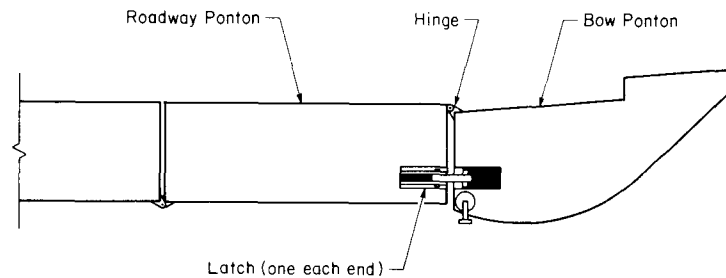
Bow ponton to roadway ponton latch and hinge arrangement.
